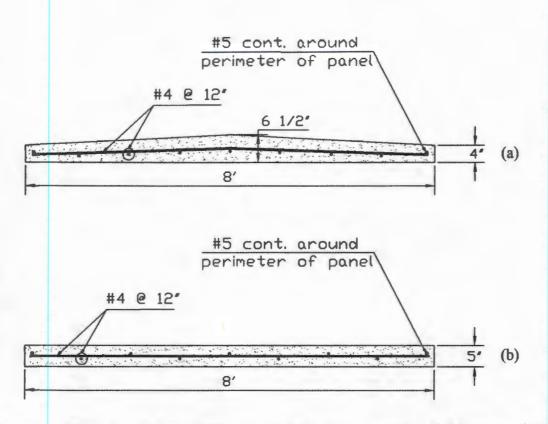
Cross-sections and reinforcement of (a) existing panel, and (b) test specimen
